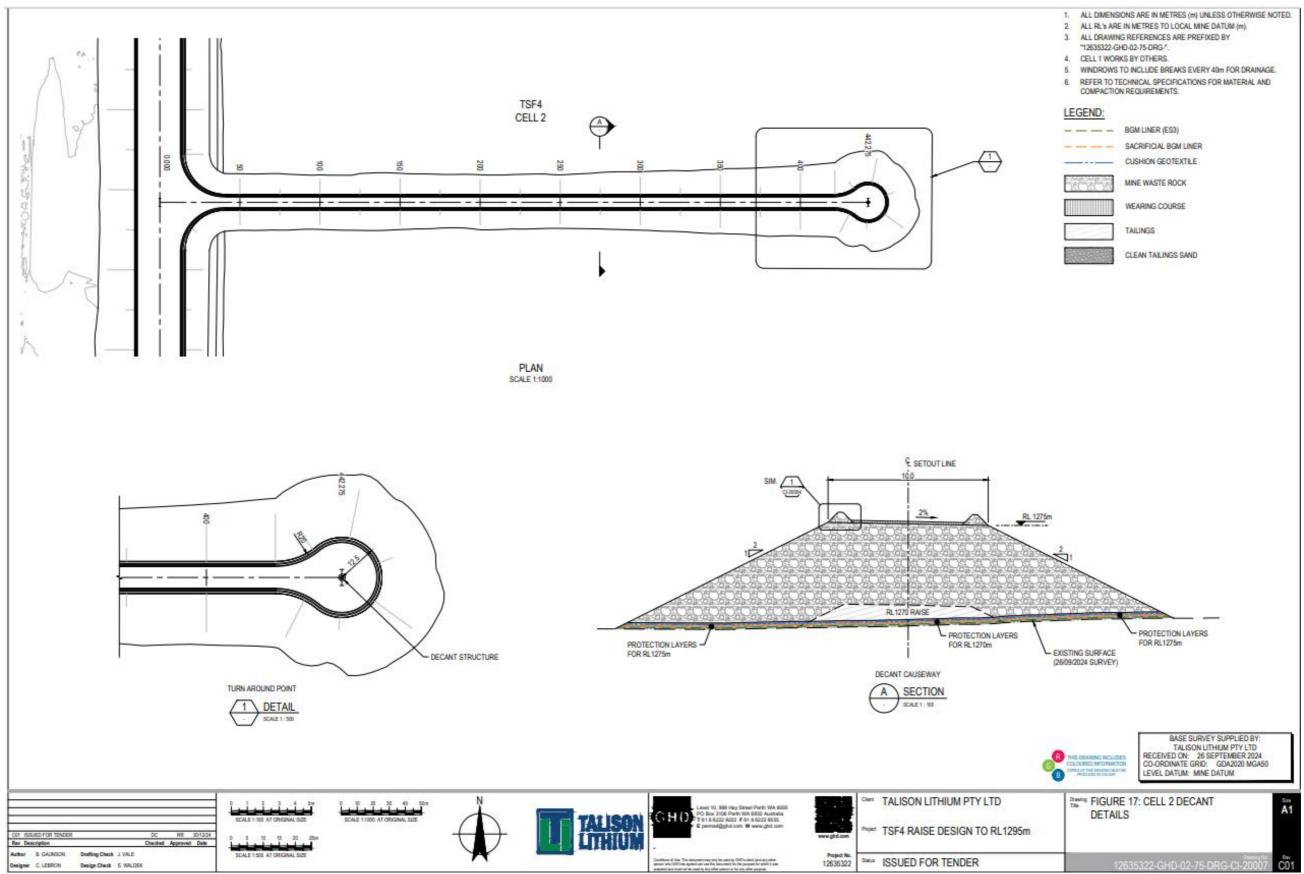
TSF embankment raise to 275 m AHD / 1275 m RL - Cell 2 decant detail
